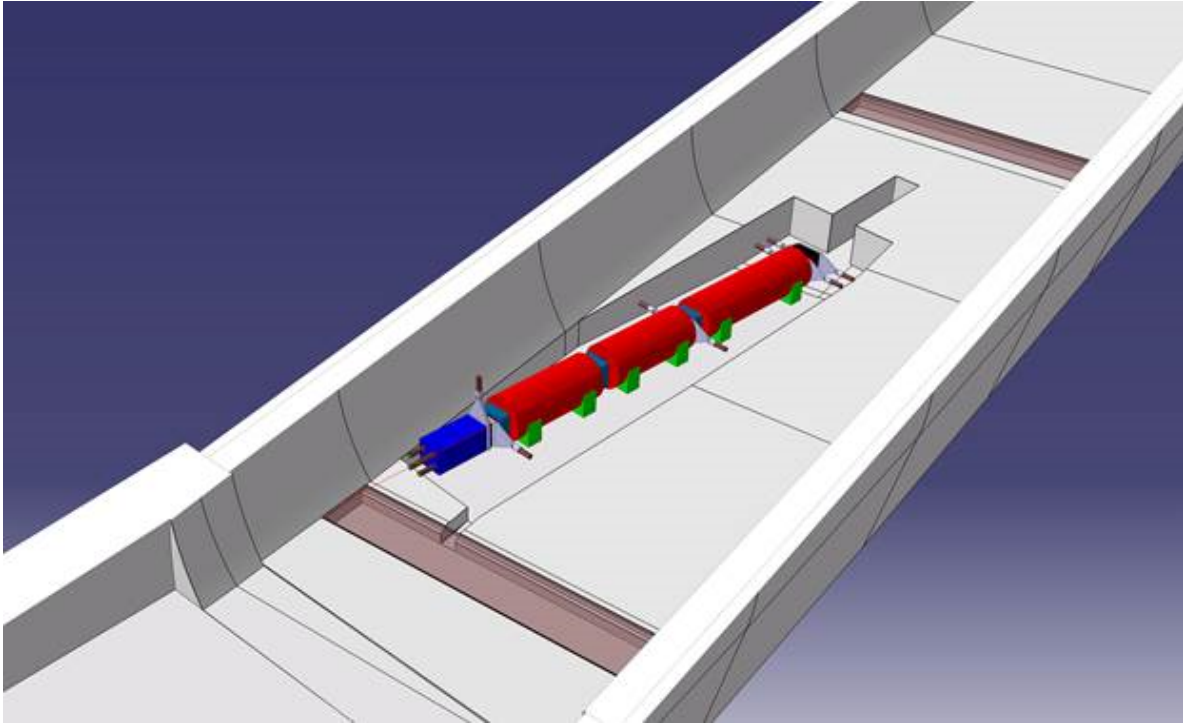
View showing extents of trench and proposed drainage in relation to tunnel TI12.
